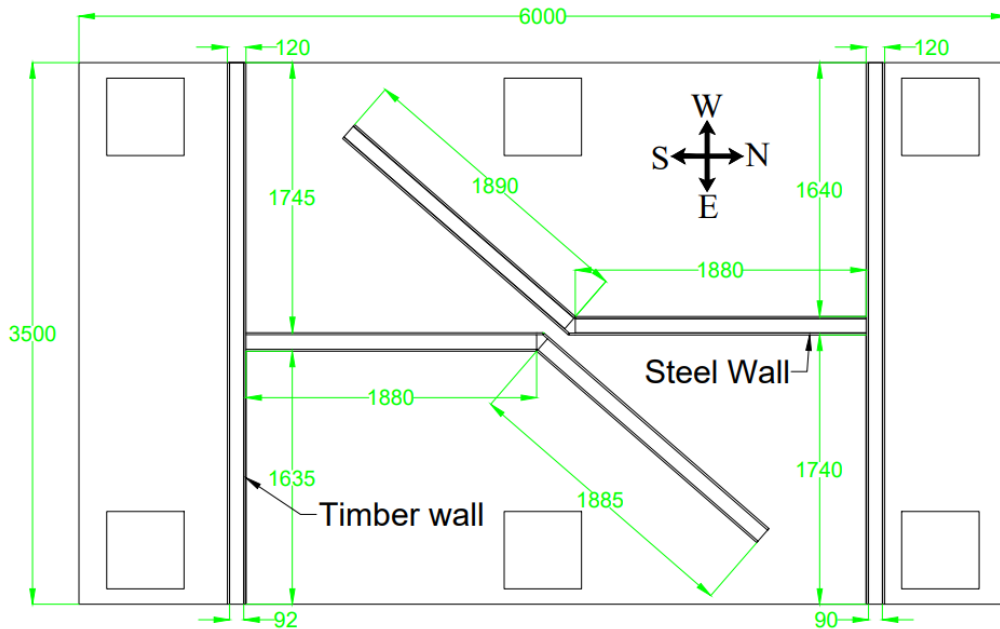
As-built wall dimensions shown in plan (dimensions in mm)
